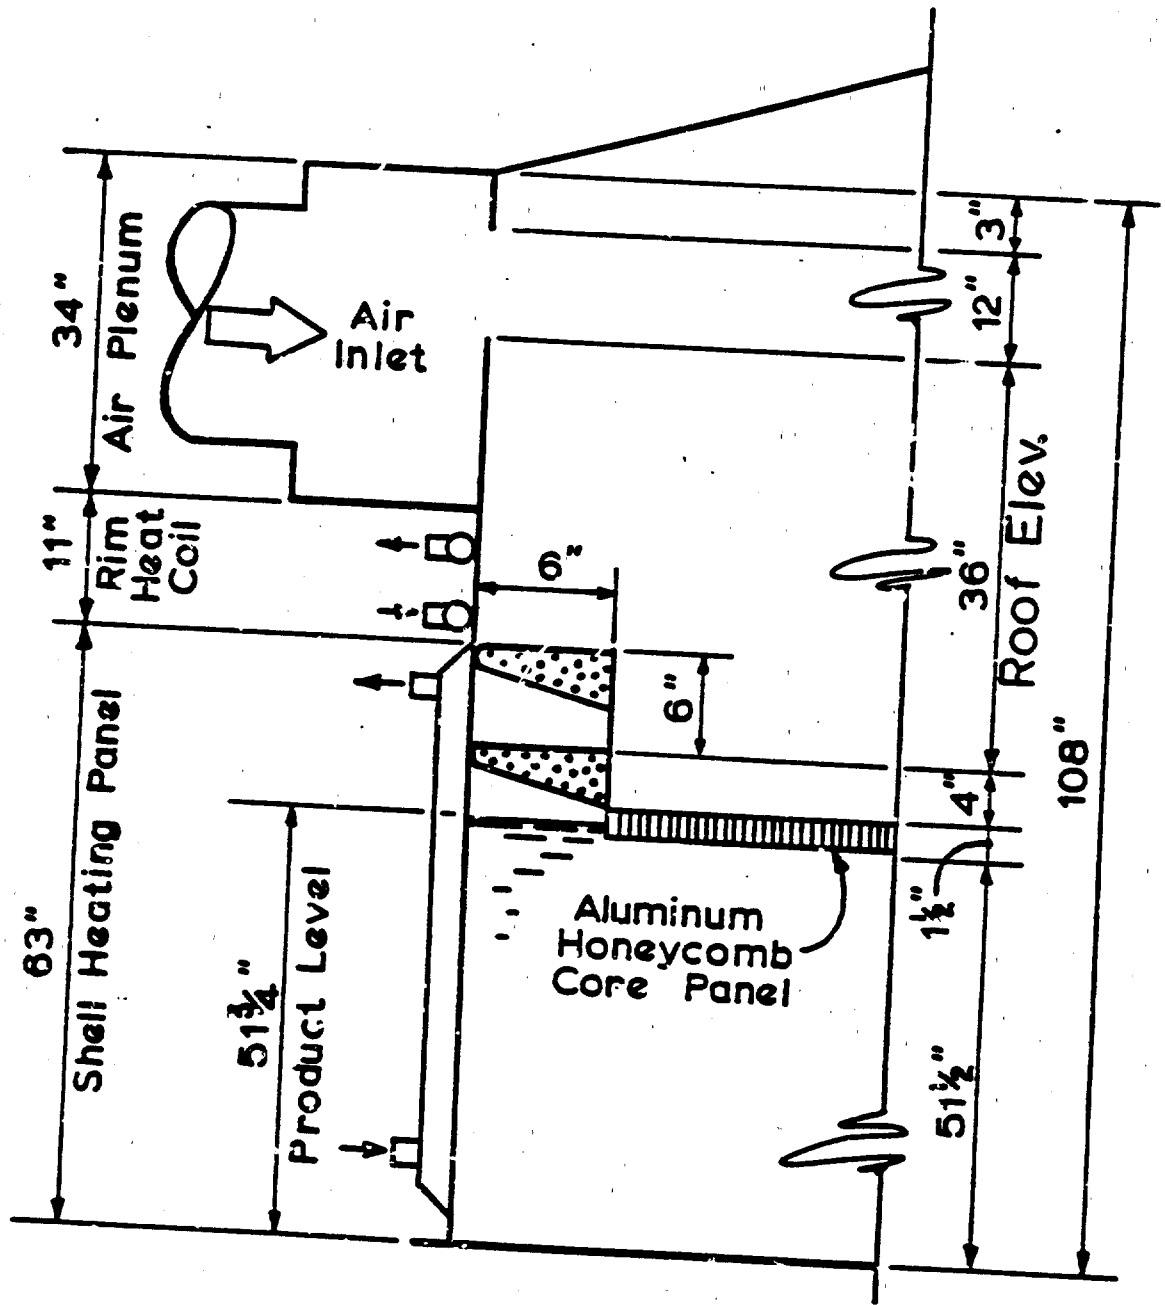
Elevation view of contact bolted IFR in test tank.¹
